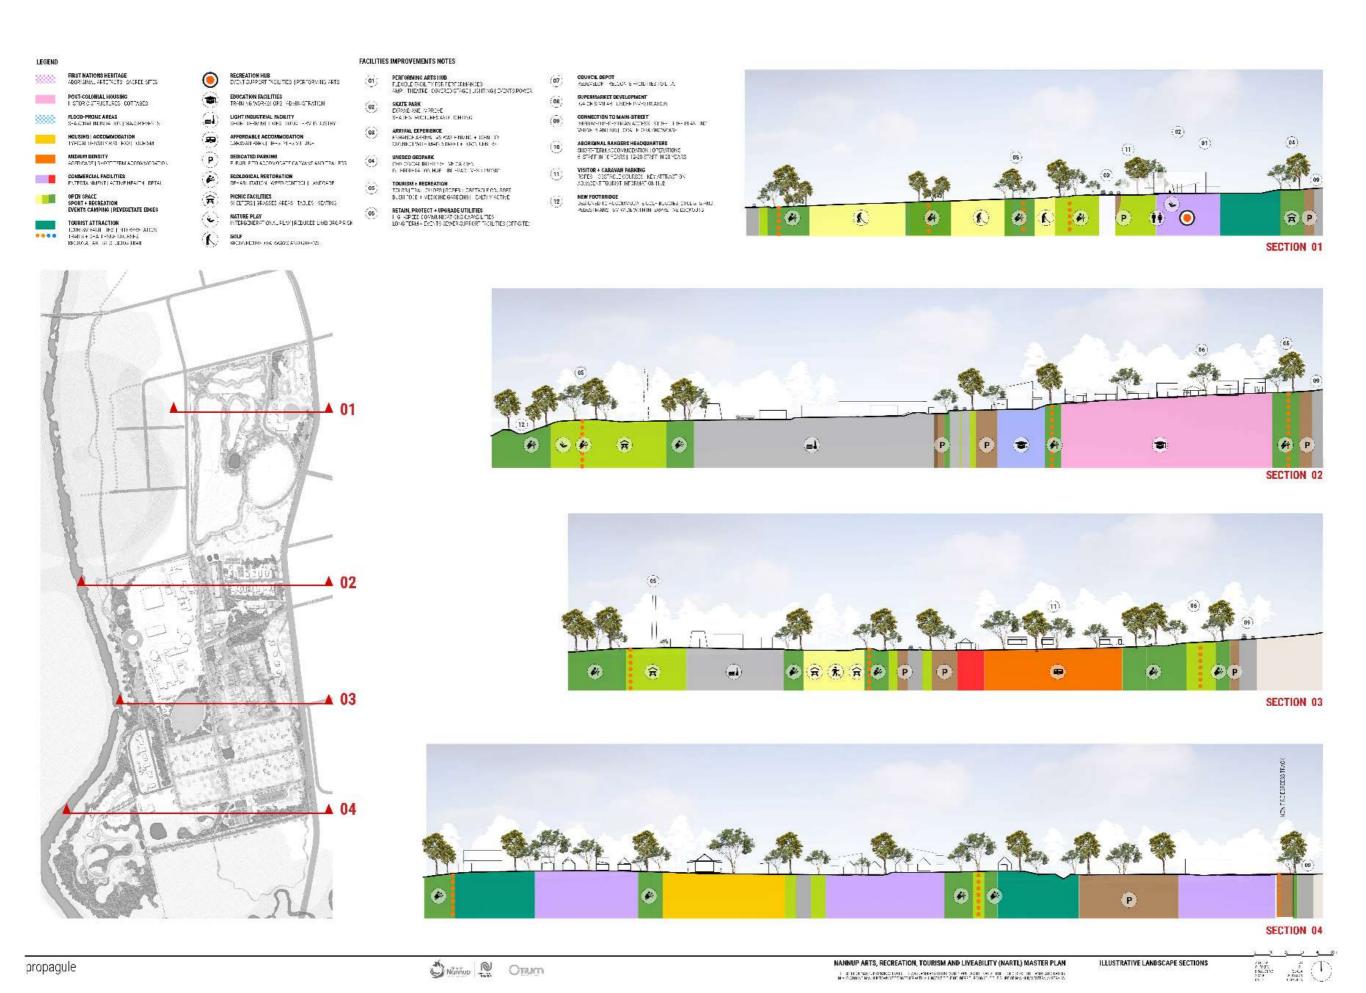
Indicative Sections through the NARTL Master Plan site – Four Locations
